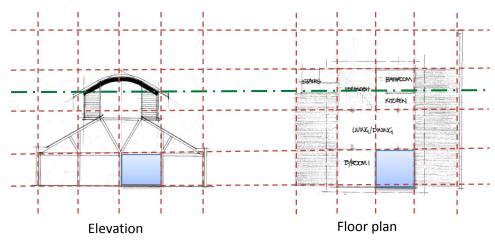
Troppo's first commissioned unbuilt house. The floor plan concept was characterized by geometry in form and formal system – square and symmetry (original sketches collected in the Perth office in 2010).
